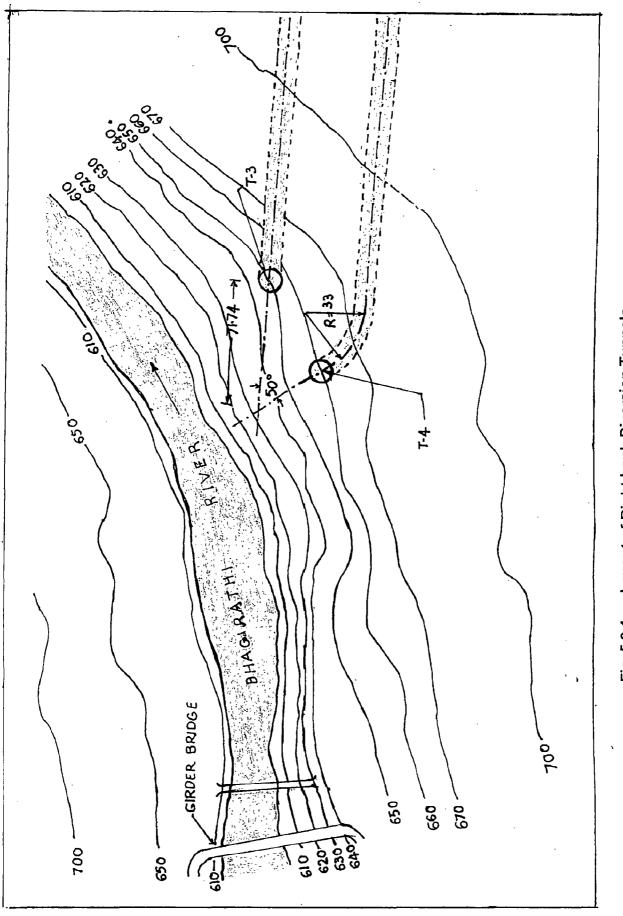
Layout of Right bank Diversion Tunnels
